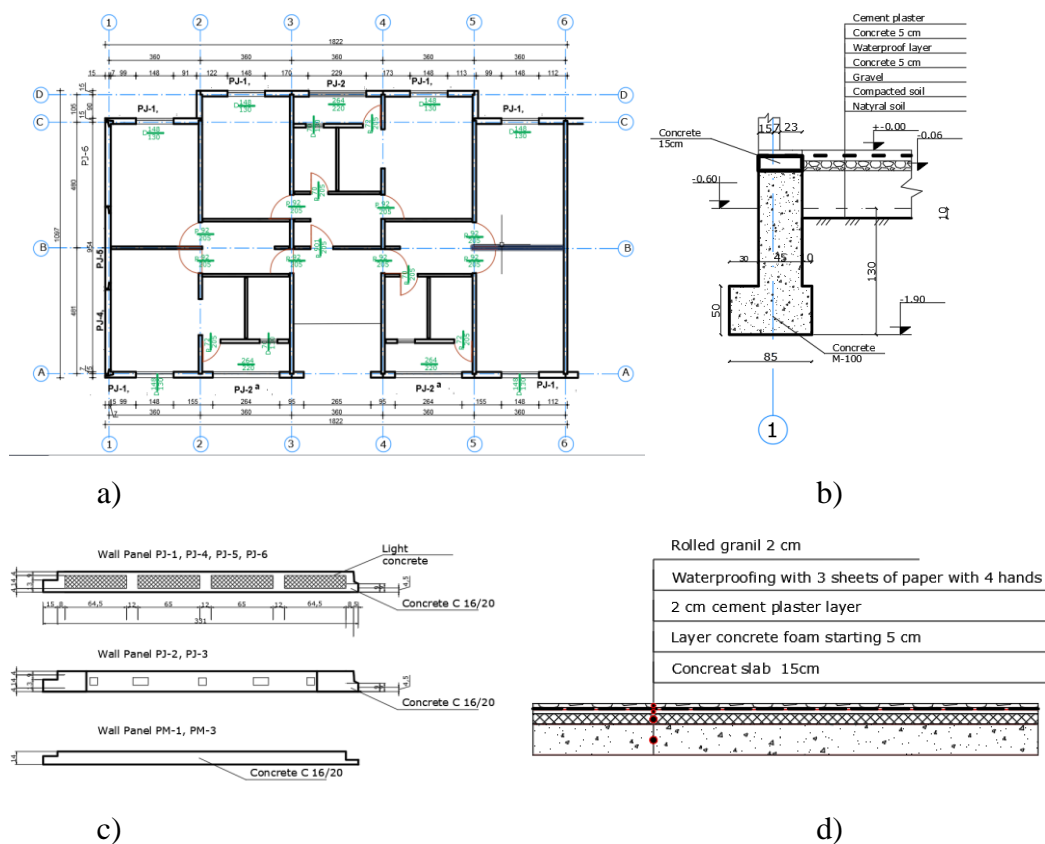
a) The plan of the building, b) foundation section c) wall cross sections d) slab section
